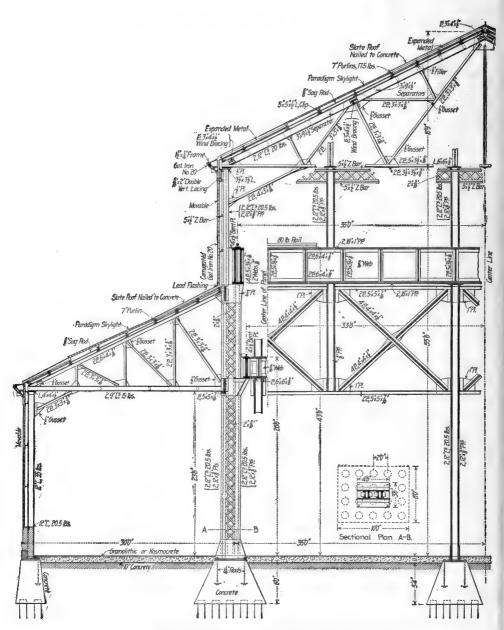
Steam Engineering Building, Brooklyn Navy Yard.
